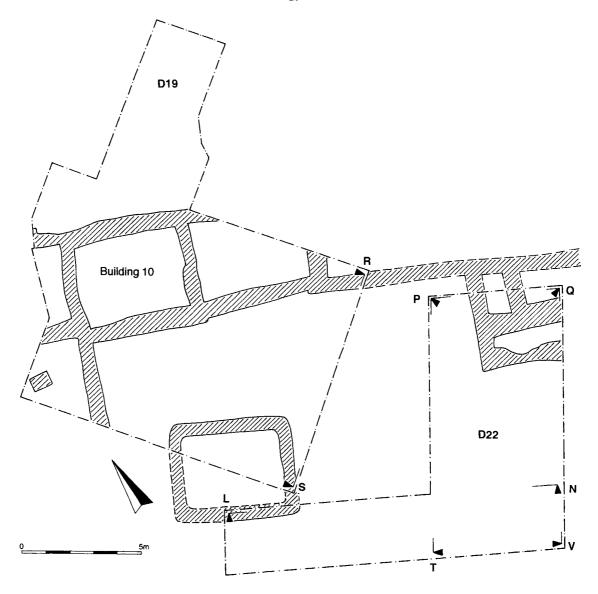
Plan of trenches D19 and D22 in phase 9A, showing location of the sections in Figs 248 and 249.
